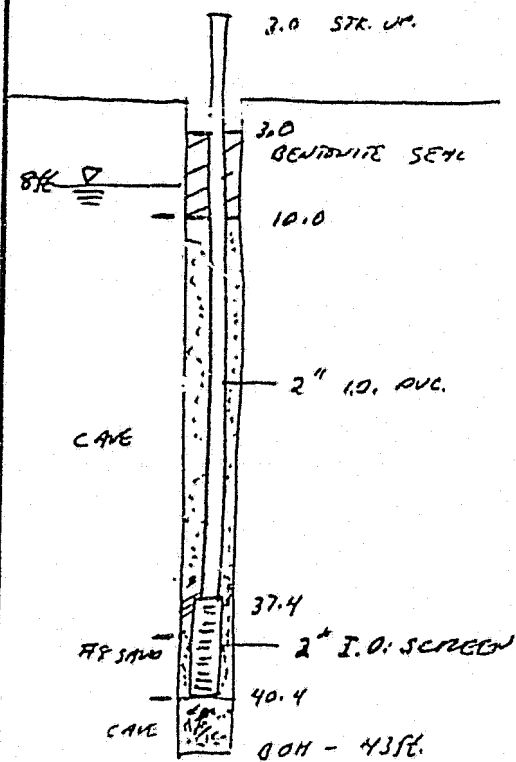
DETAILS OF WELL INSTALLATIONS AT SLOUGH 9B
